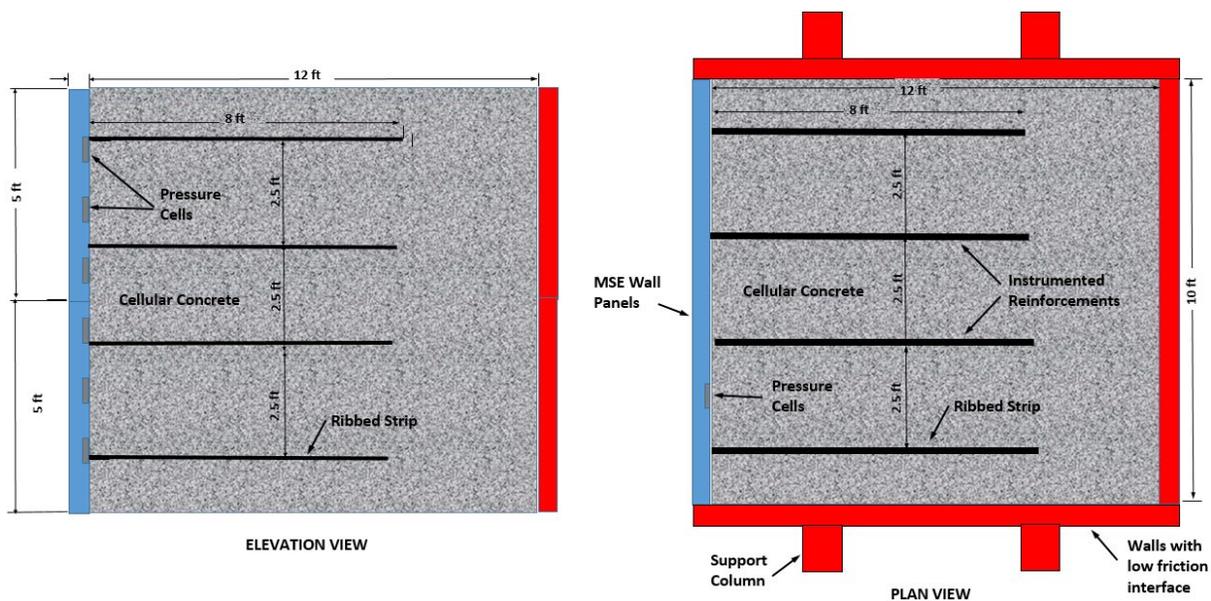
Schematic plan and profile drawings of the test with reinforced LCC behind two 5' x 10' MSE wall panels
